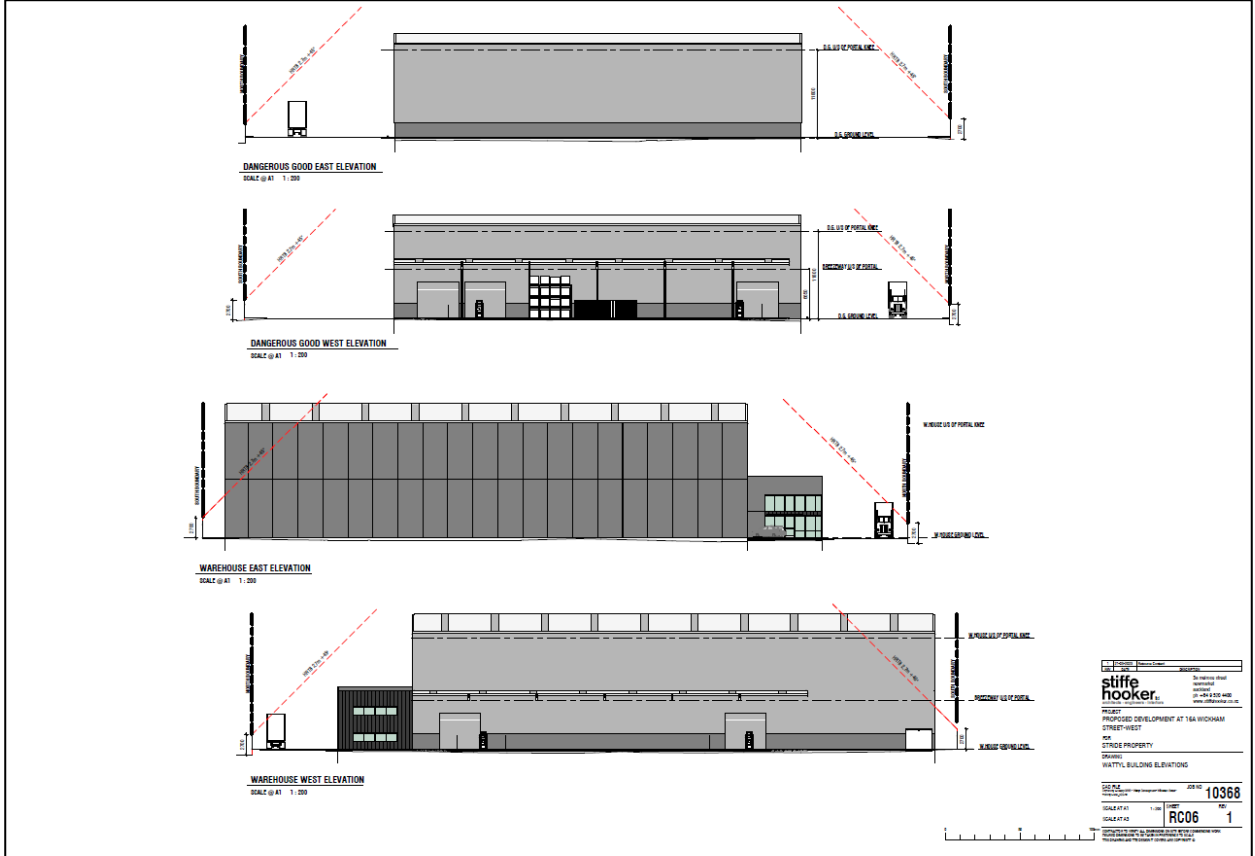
Proposed Elevations Plan of Stage 2 buildings
